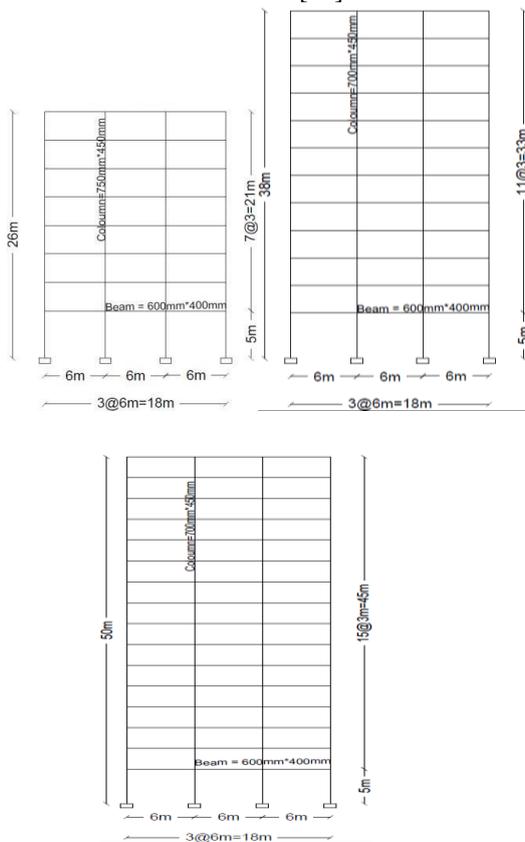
Elevation of 8, 12 and 16 Storey MRFs
